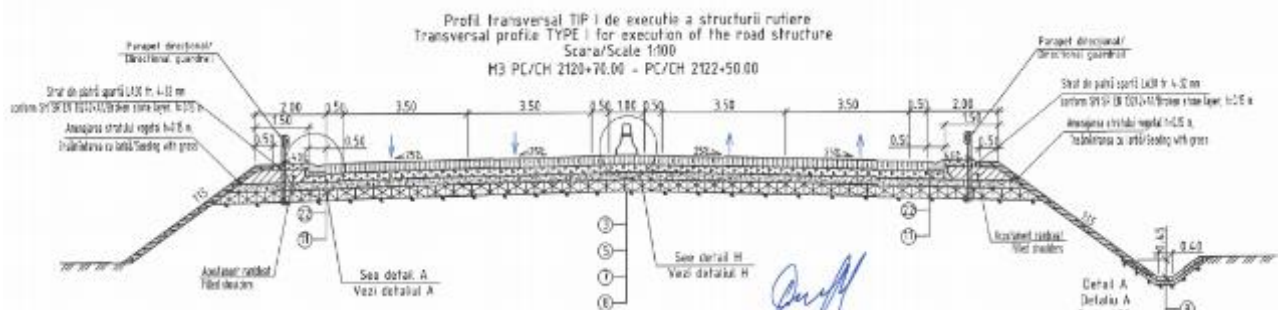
Typical cross-section on section M3 km211+980 - km213+690 and M3.1
